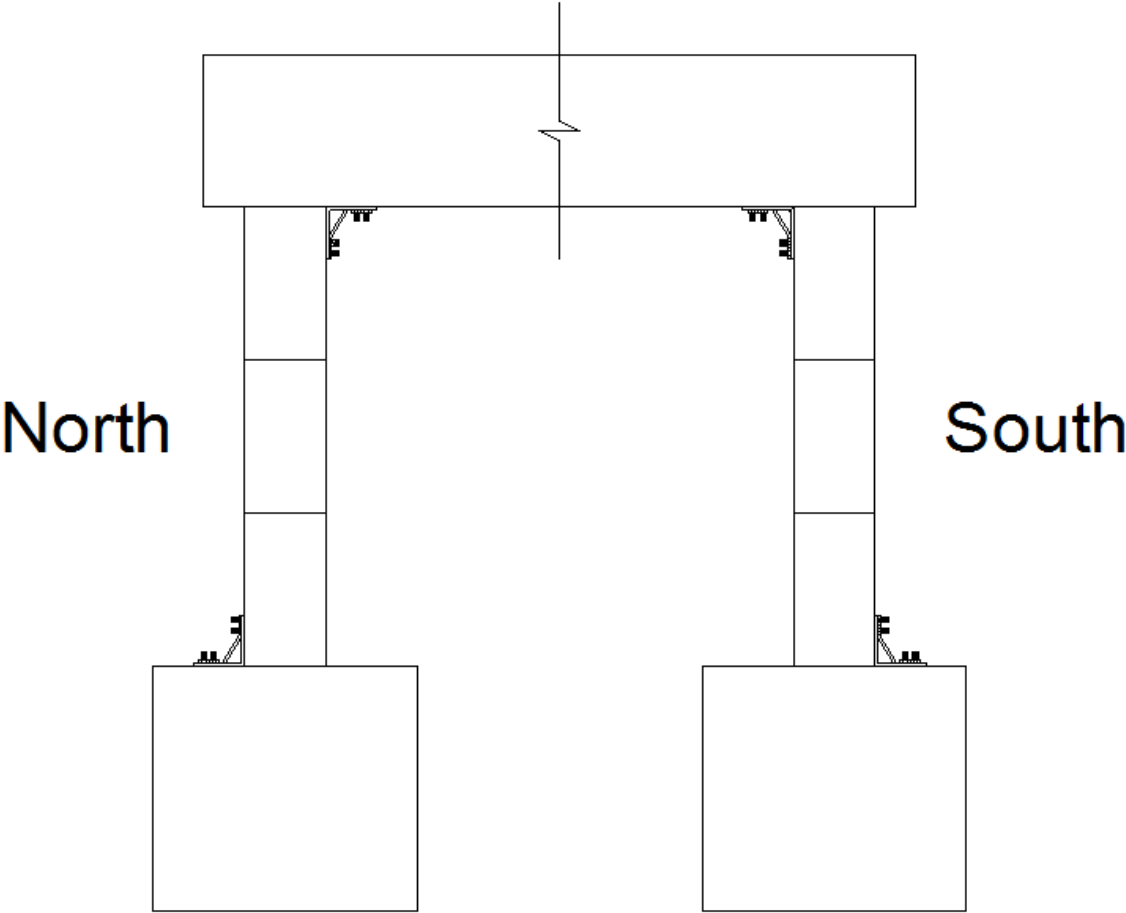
Layout of sacrificial steel angles in specimen F-FRP3-S
